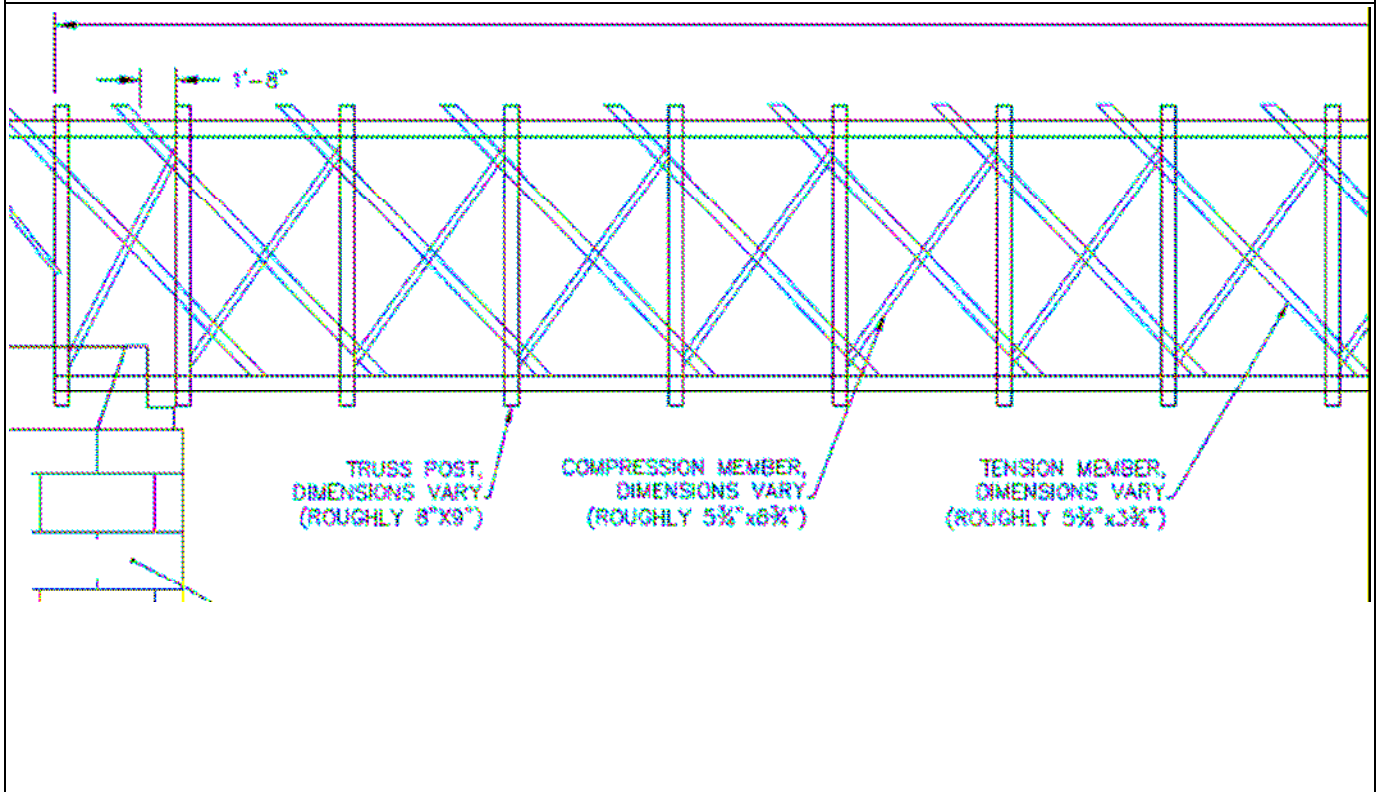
Vertical truss members, existing conditions (source: HEB 2012)
